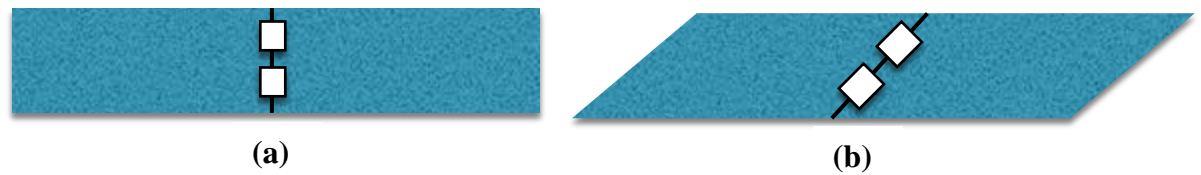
Plan view of the bridge deck with the orientation of the columns in (a) straight bridges versus (b) skewed bridges
